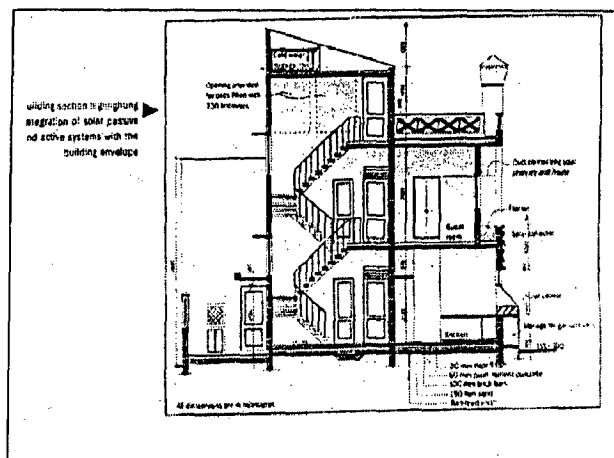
Building section showing solar passive and active systems with the building envelope(9)
